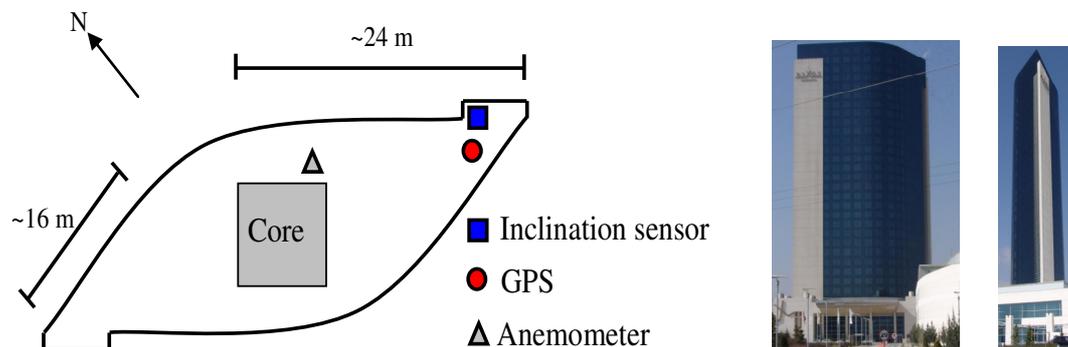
Plan view and Pictures of the Rixos Building in Konya
